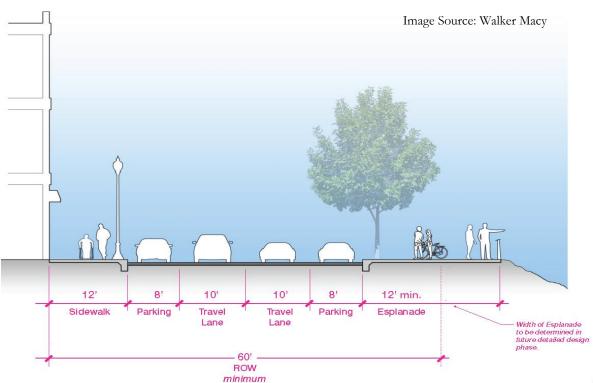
Mixed-Use Local Street with Esplanade (Water Street)
